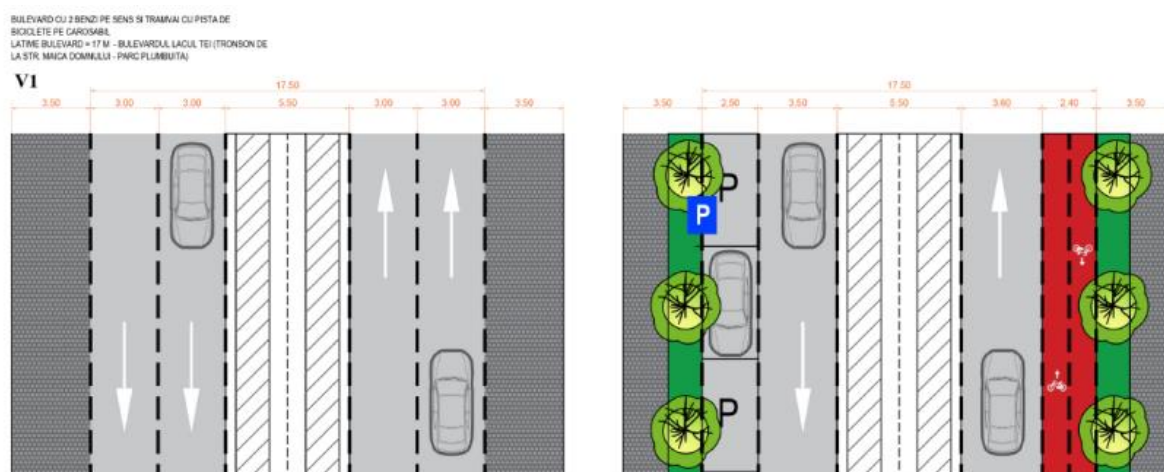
Current Blvd. Lacul Tei layout (left) and proposed street improvement (right)
